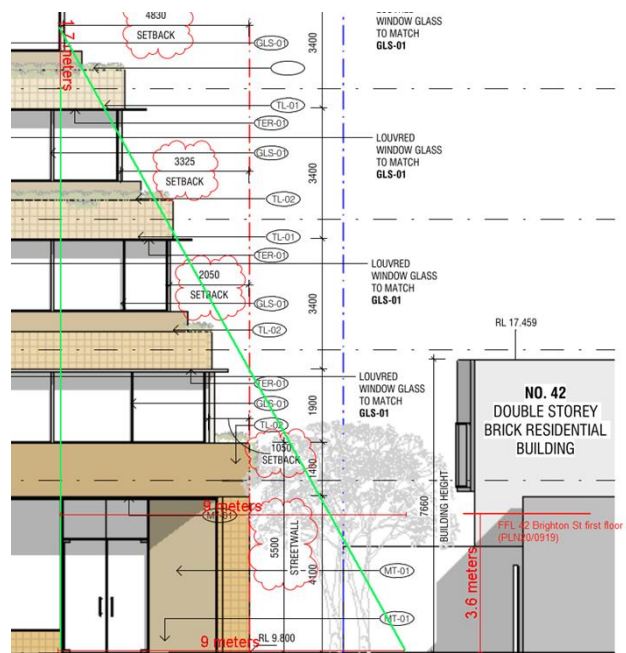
Mark-up of south elevation showing Level 4 views (in green) blocked by lower built form
